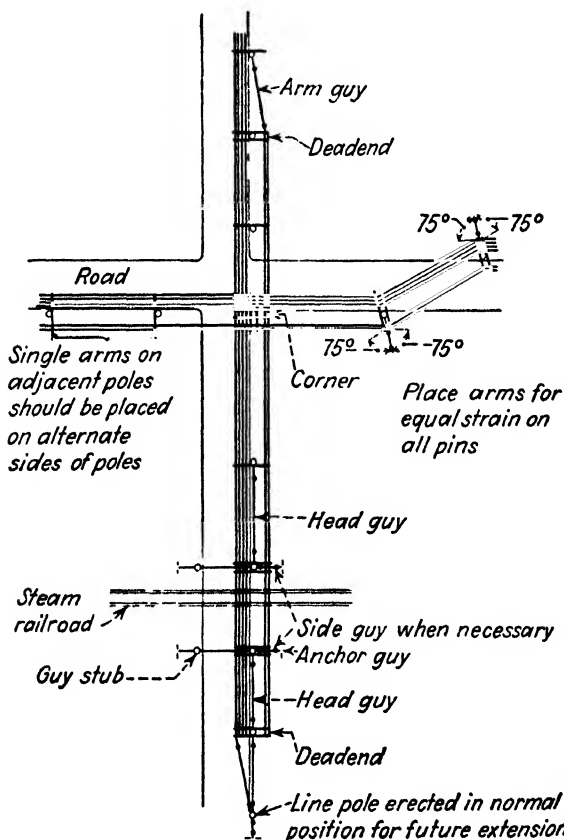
Typical pole line showing use of arms and guys. (Courtesy Consolidated Gas Electric Light and Power Co.)
